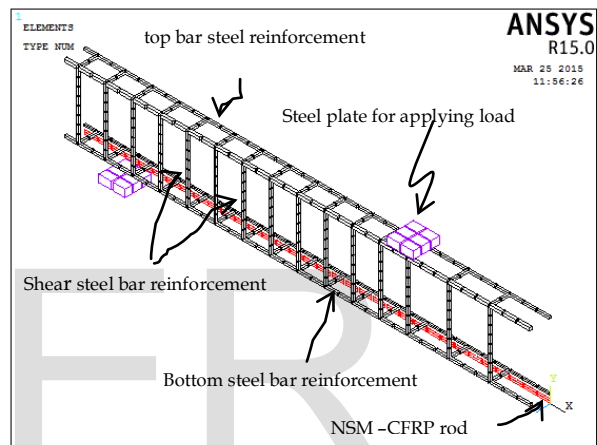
Steel Plate, Steel Support and Reinforcement Configuration for beams
